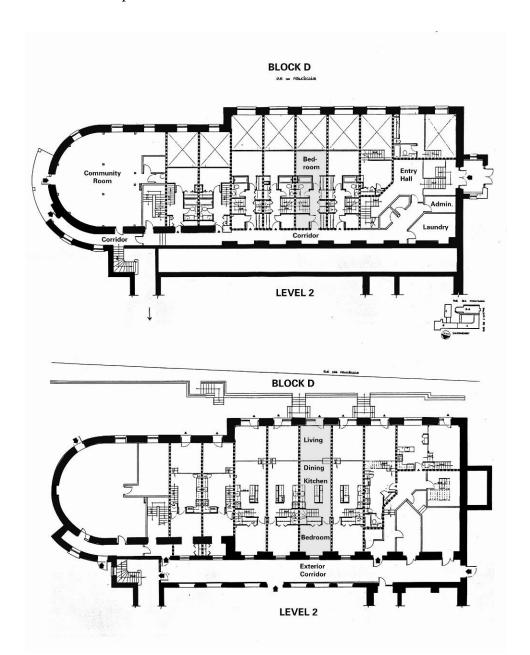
Floor plans of the two-story units inserted into the chapel of the DF. X-out areas on the drawing indicate a double-storey space. Plans prepared by Michael Doyle were derived from those provided courtesy of the property manager based on the architect's plans of the building.
